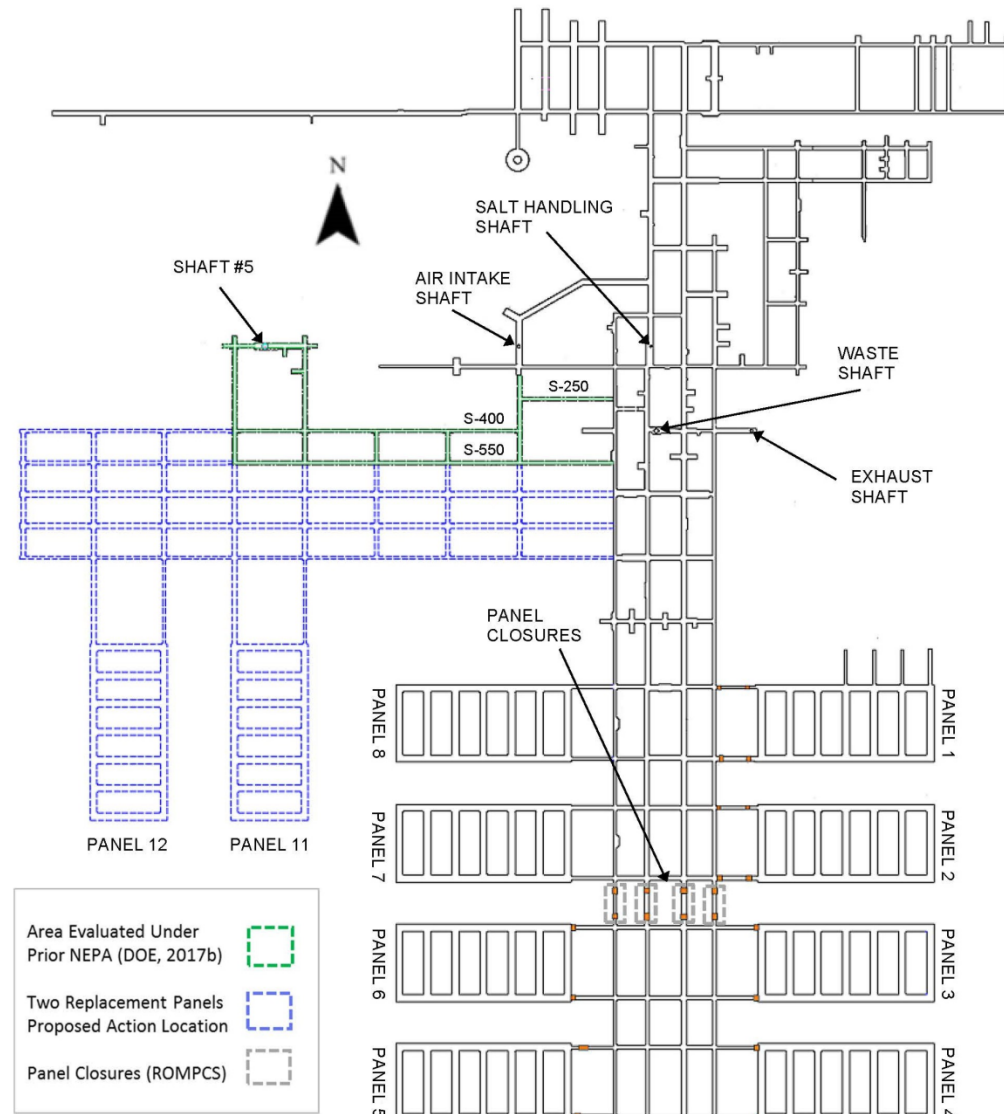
, PROPOSED LOCATION FOR REPLACEMENT PANELS 11 AND 12
